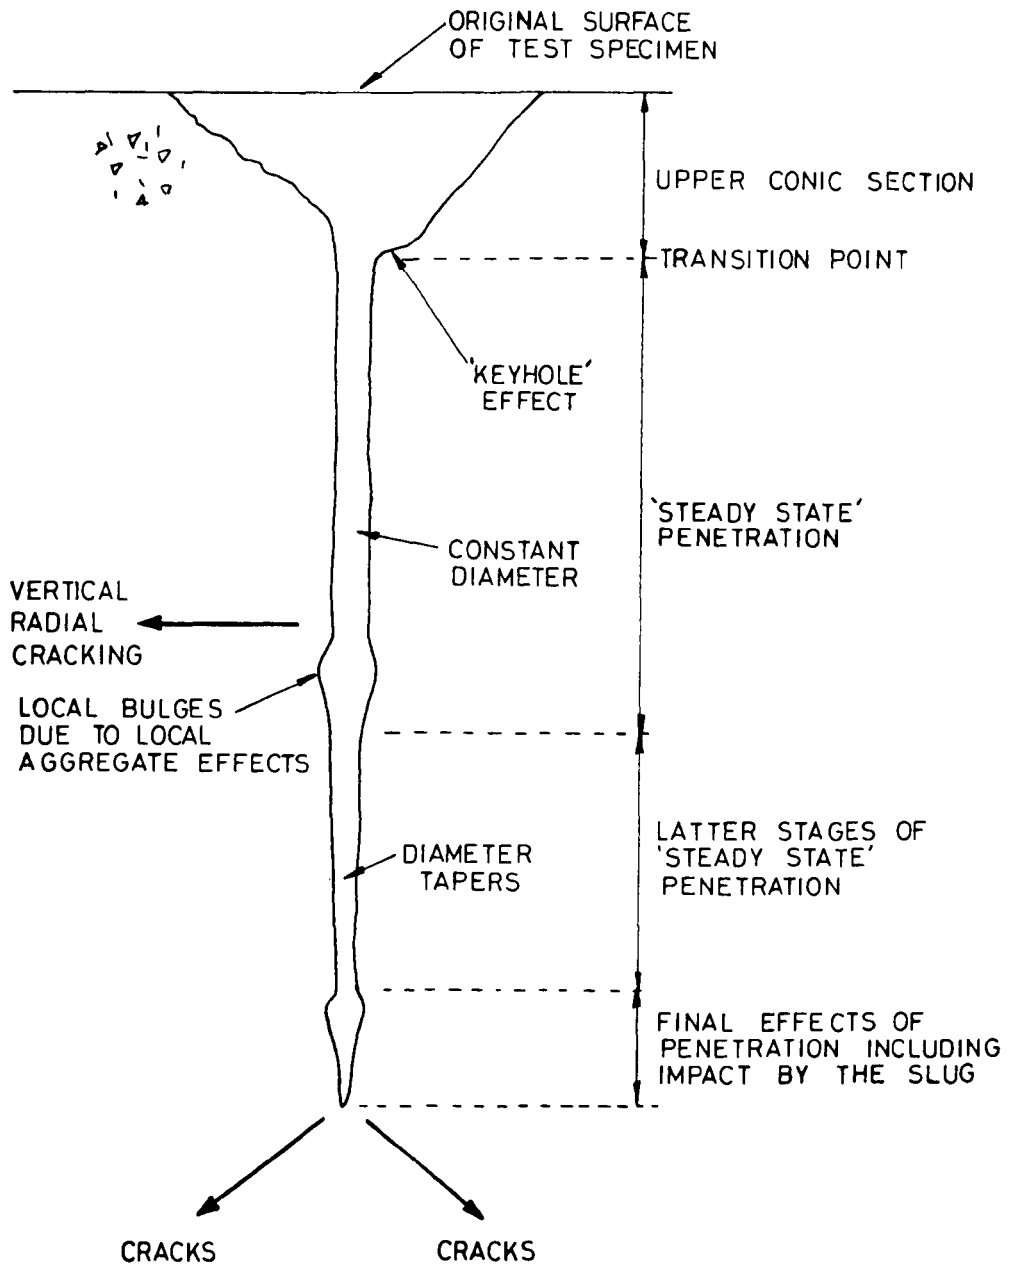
CROSS SECTION OF A TYPICAL HOLE FORMED IN CONCRETE BY A SHAPED CHARGE JET IMPACT
